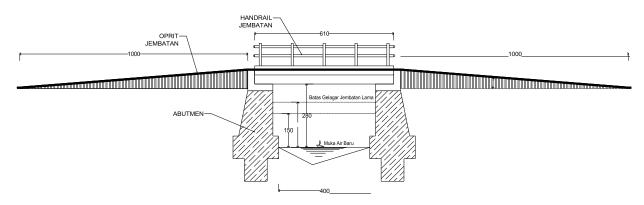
, Reconstruction of Kampung Baru Village bridge (author analysis, 2020)
